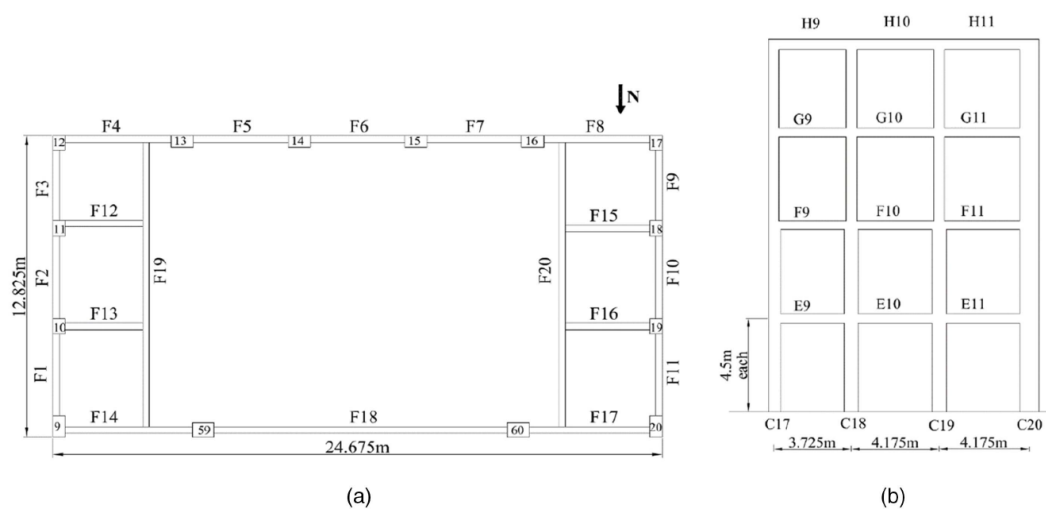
Layout of the case study building: (a) plan; (b) elevation (Nataraj et.al 2021).
